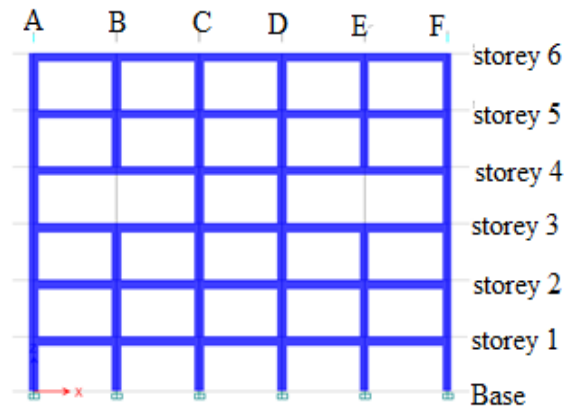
8 Section view of buildings with floating column at parallel position, 2nd floor
